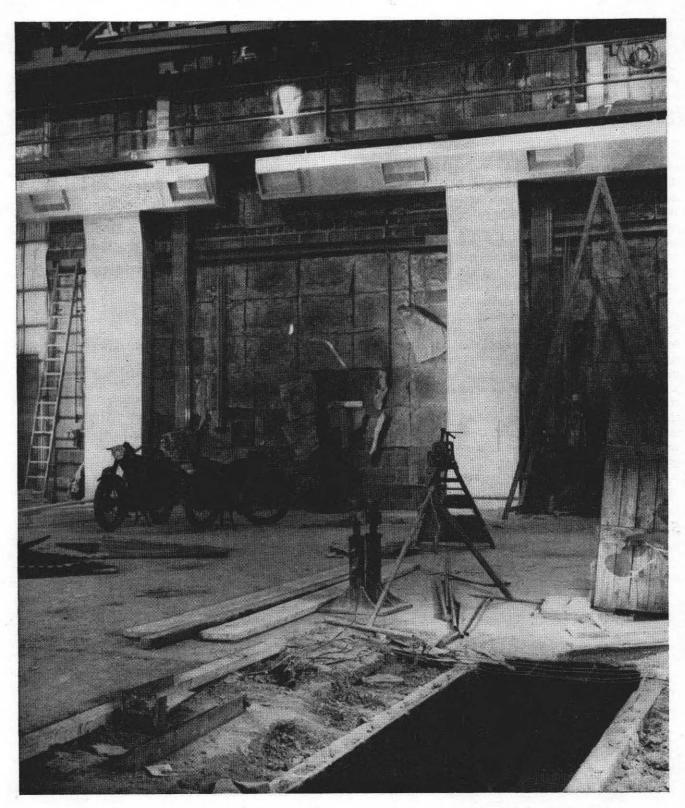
Plate A — Progress photograph showing underground vent ducts and vertical metal risers in Studio 1
